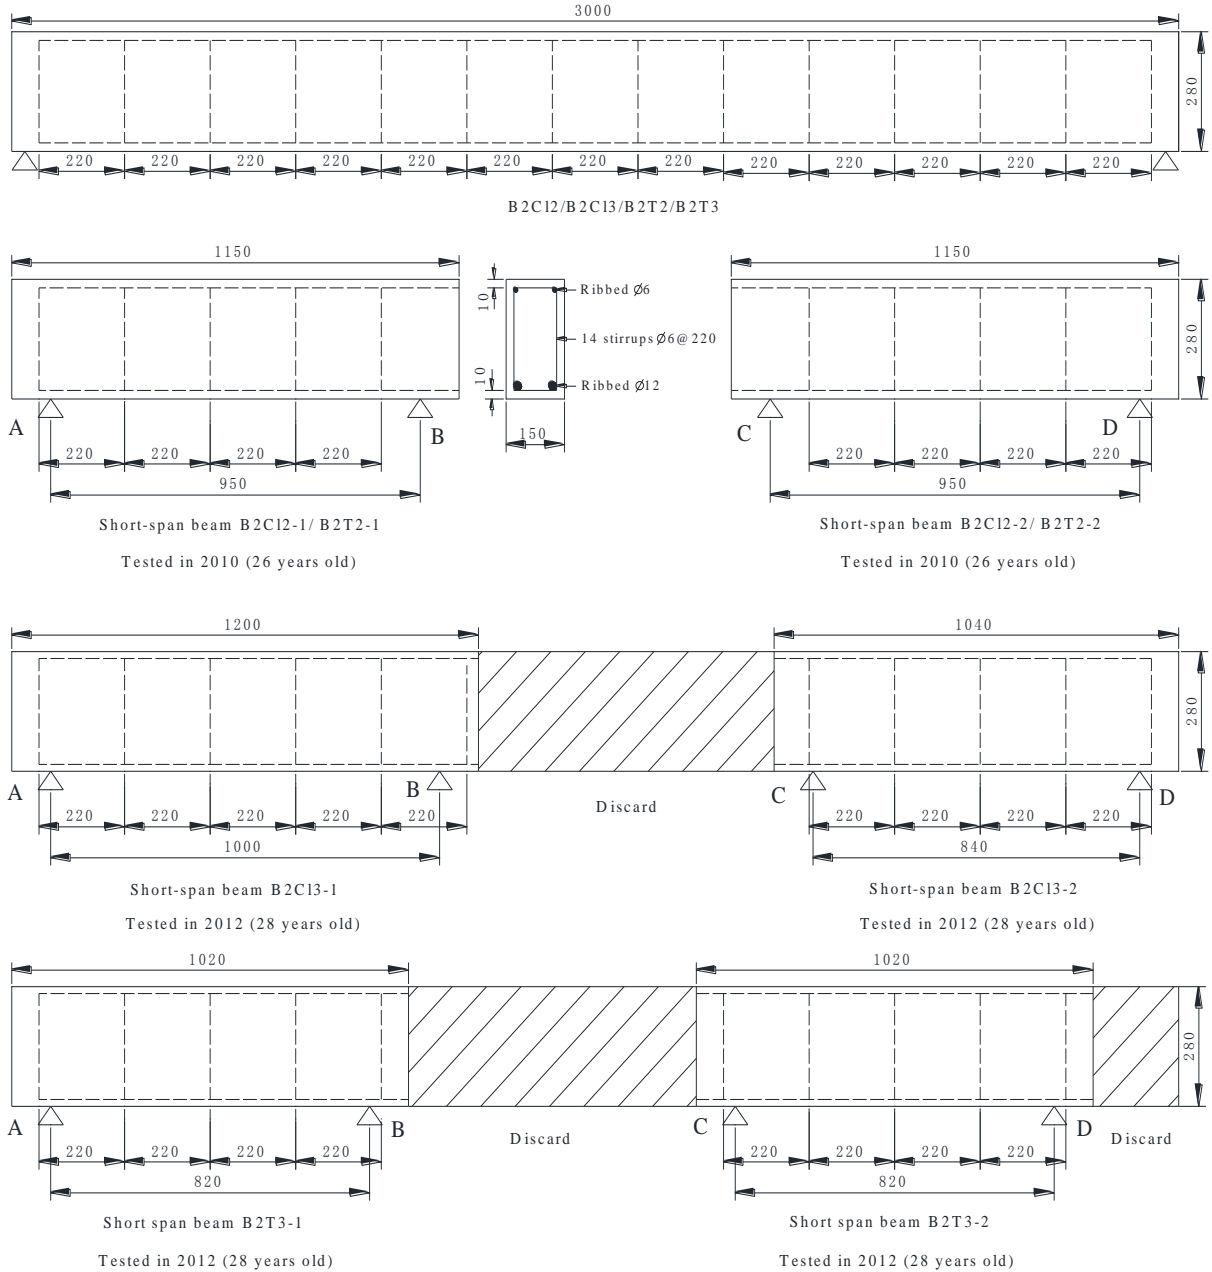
Layout of the reinforcement for the target beams (mm)
